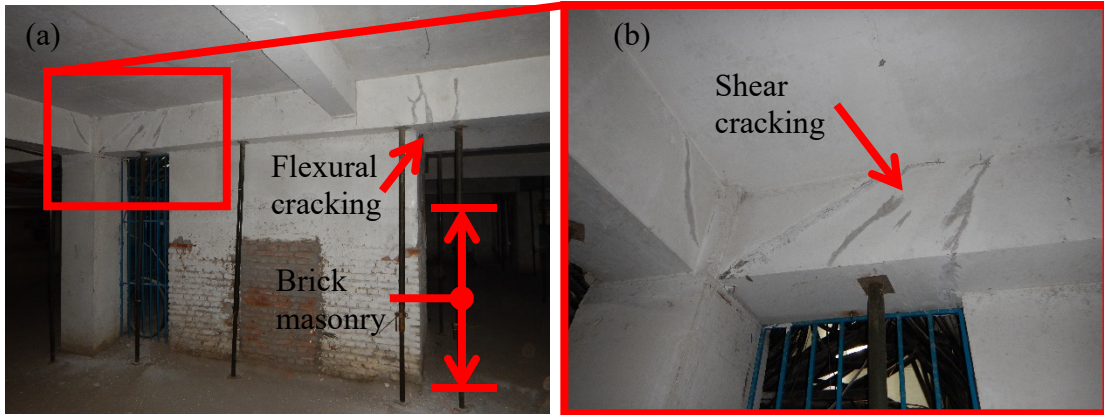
CTC Mall basement: (a) concrete elevator enclosure terminating on brick masonry; (b) close-up of beam shear cracking.
